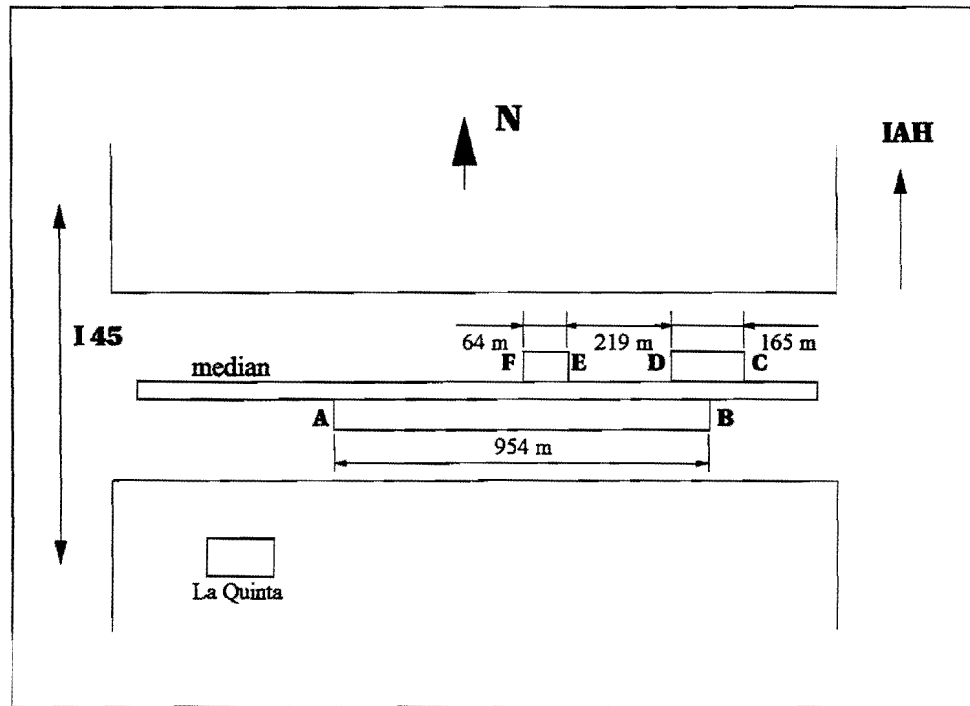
Layout of the Pavement Sections Monitored in BW 8 North.
